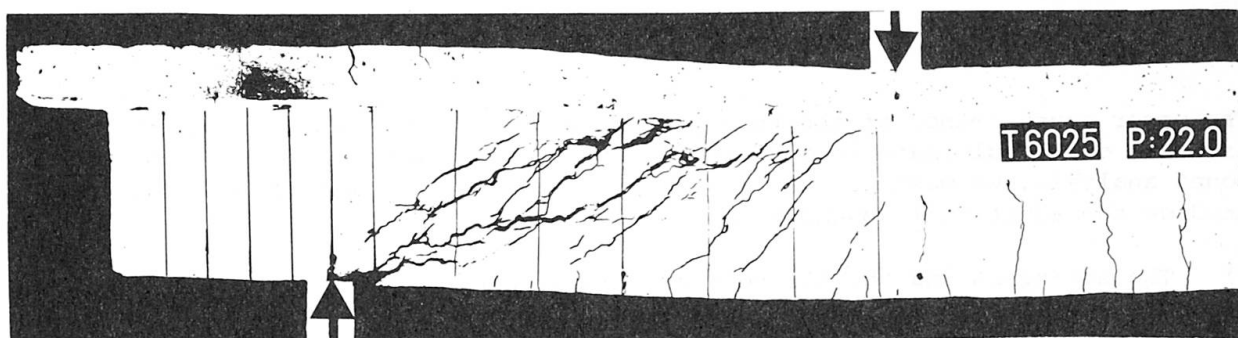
Shear failure of beam with web reinforcement (BRÆSTRUP et al [2])
